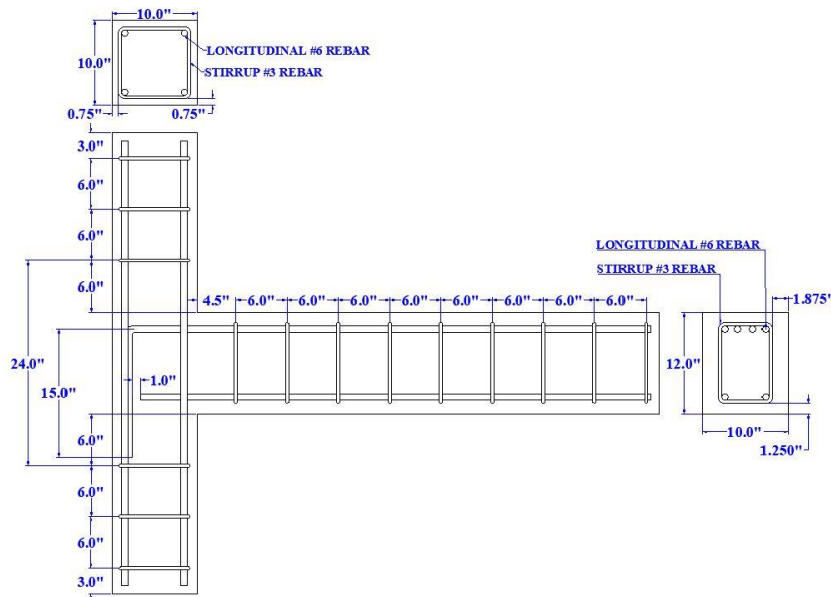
Reinforcement details of control joint specimens (Majjigapu 2020)
